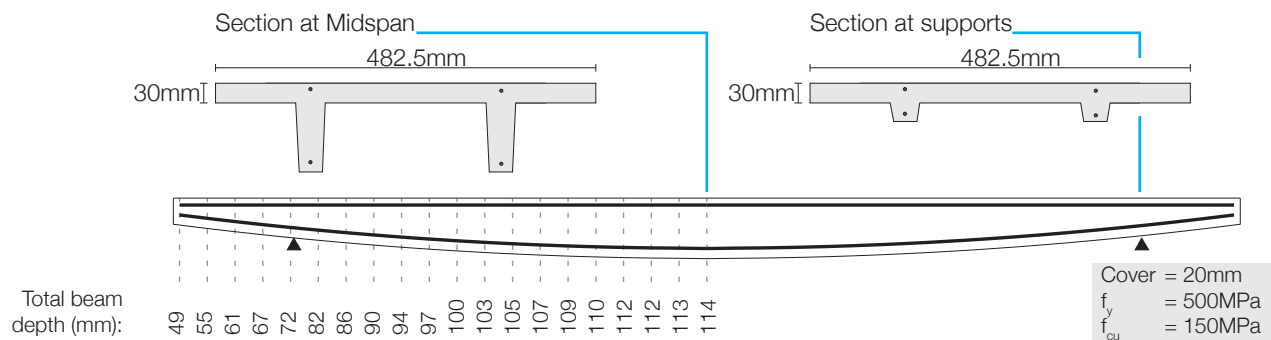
Beam 7\_4 elevation, determined for flexure.
